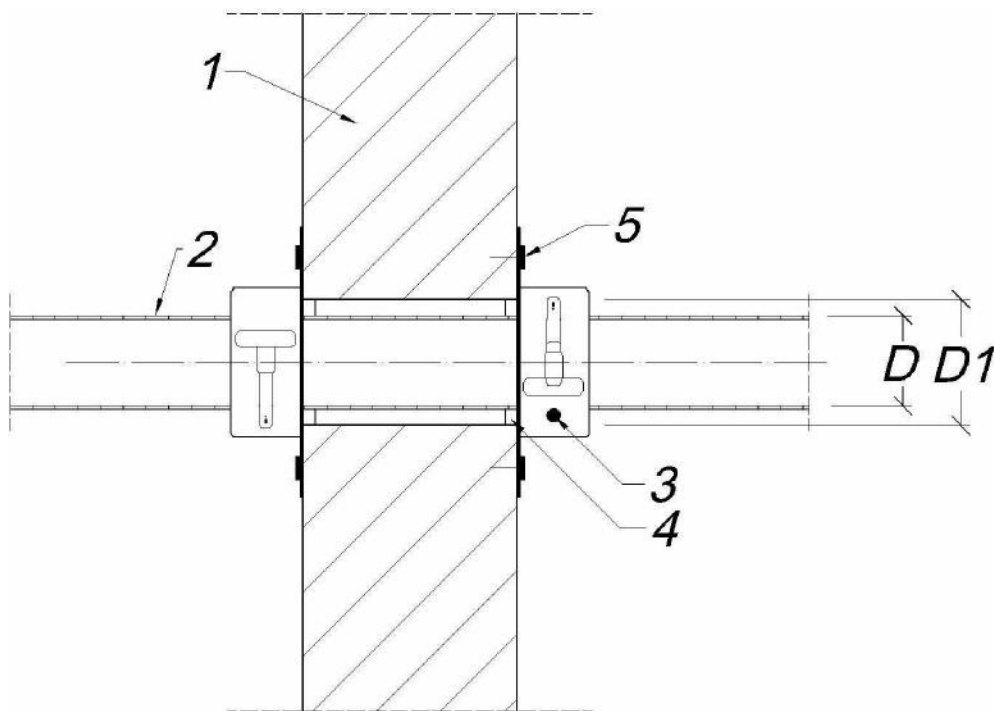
The fire-proof collars ASTRO COLLAR
